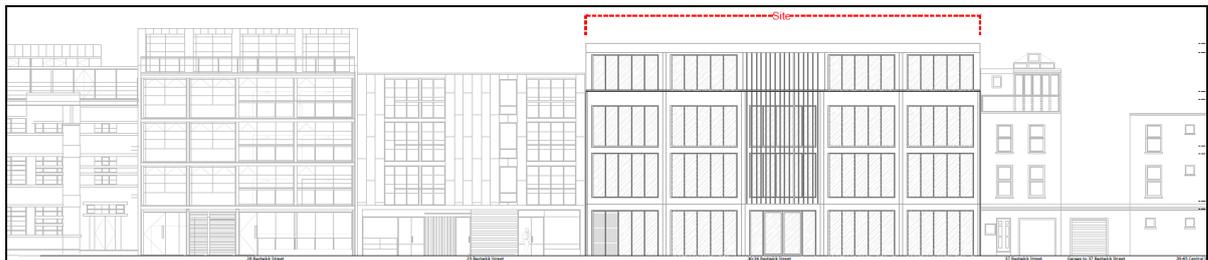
Drawing 1927.PP.14 showing the front elevation in the wider Bastwick Street context
